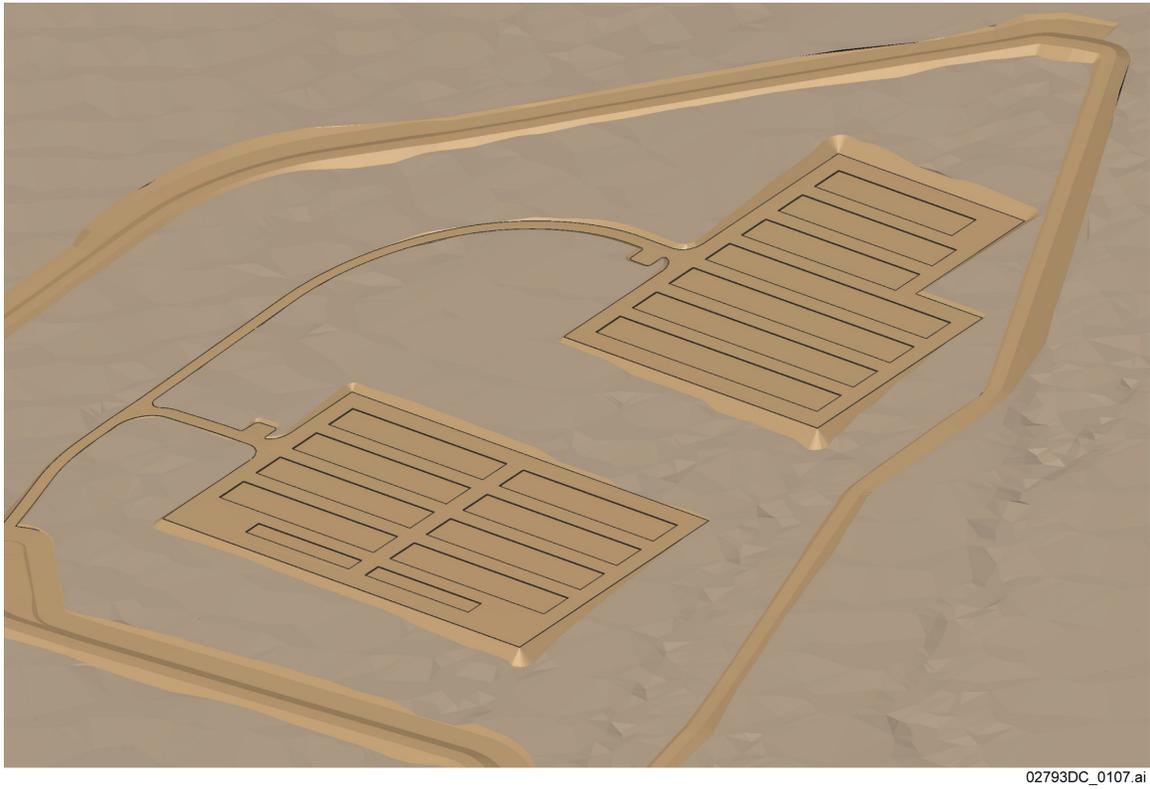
3D Layout of Aging Pad Sites Showing Surrounding Roadways
